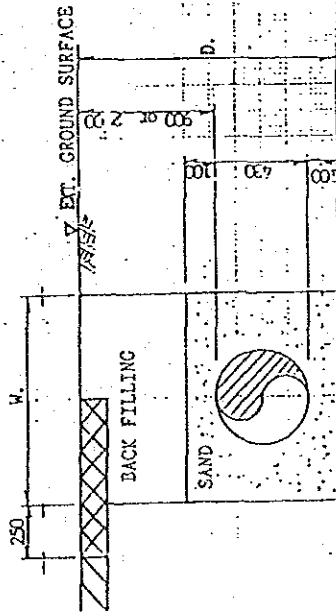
TYPICAL CROSS SECTION OF PIPE UNDER ROAD
